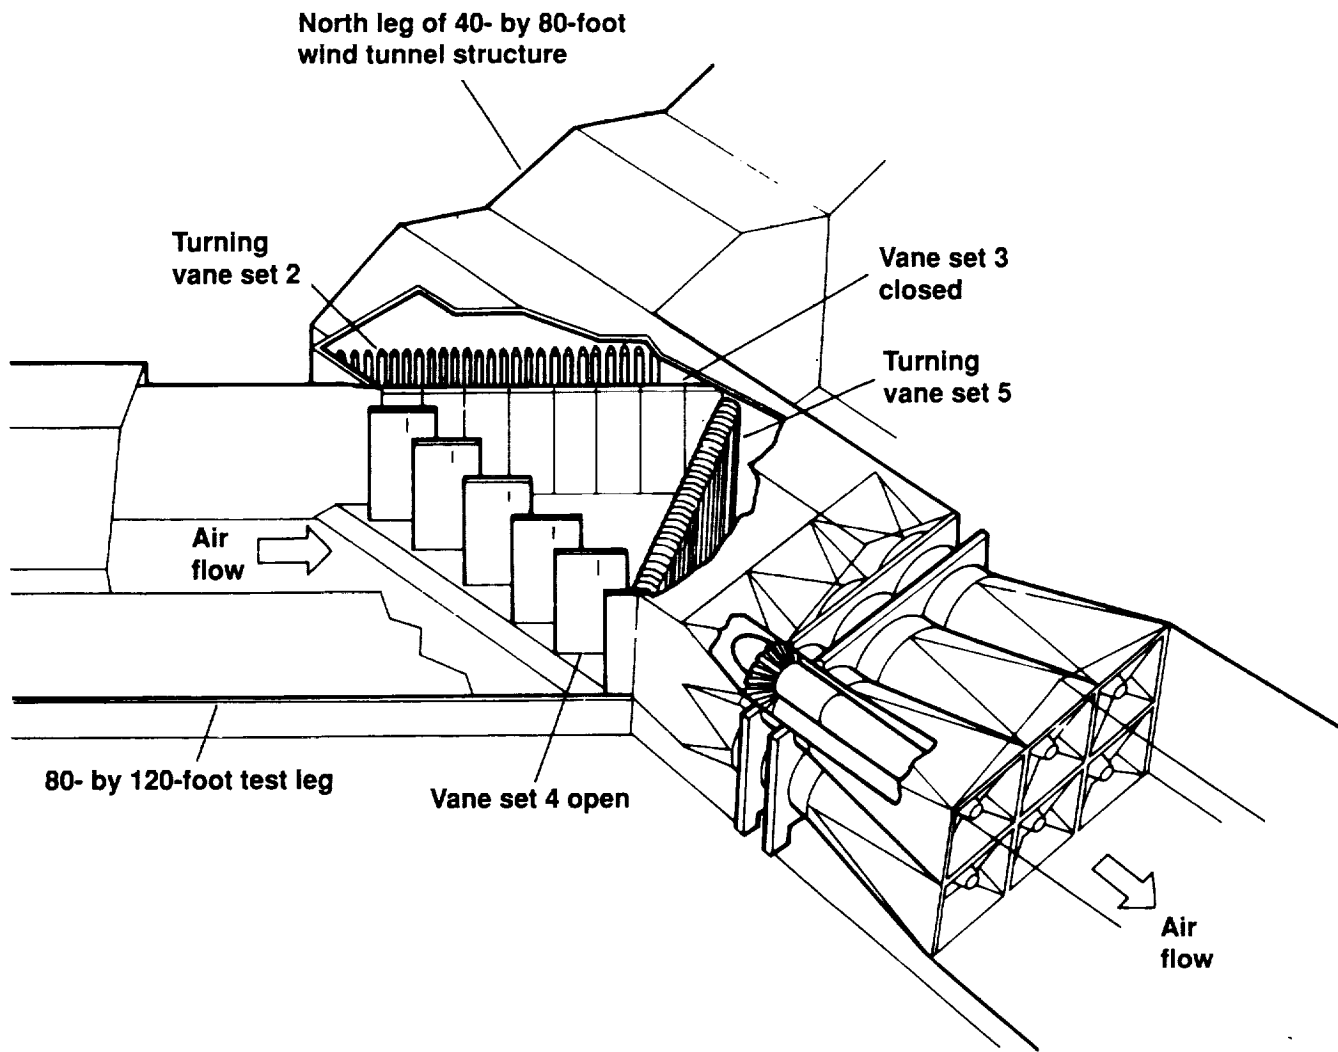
Intersection between the 40- by 80-Foot and 80- by 120-Foot Wind Tunnels (80- by 120-Foot Wind Tunnel mode).
